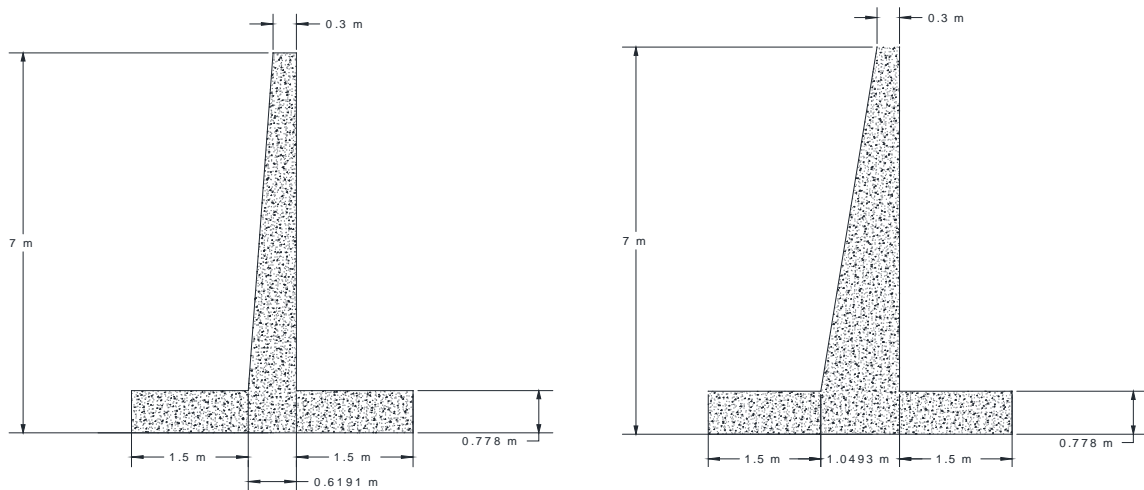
Optimum shape of retaining wall with load of (a) 20kN/m<sup>2</sup>, (b) 40kN/m<sup>2</sup>
